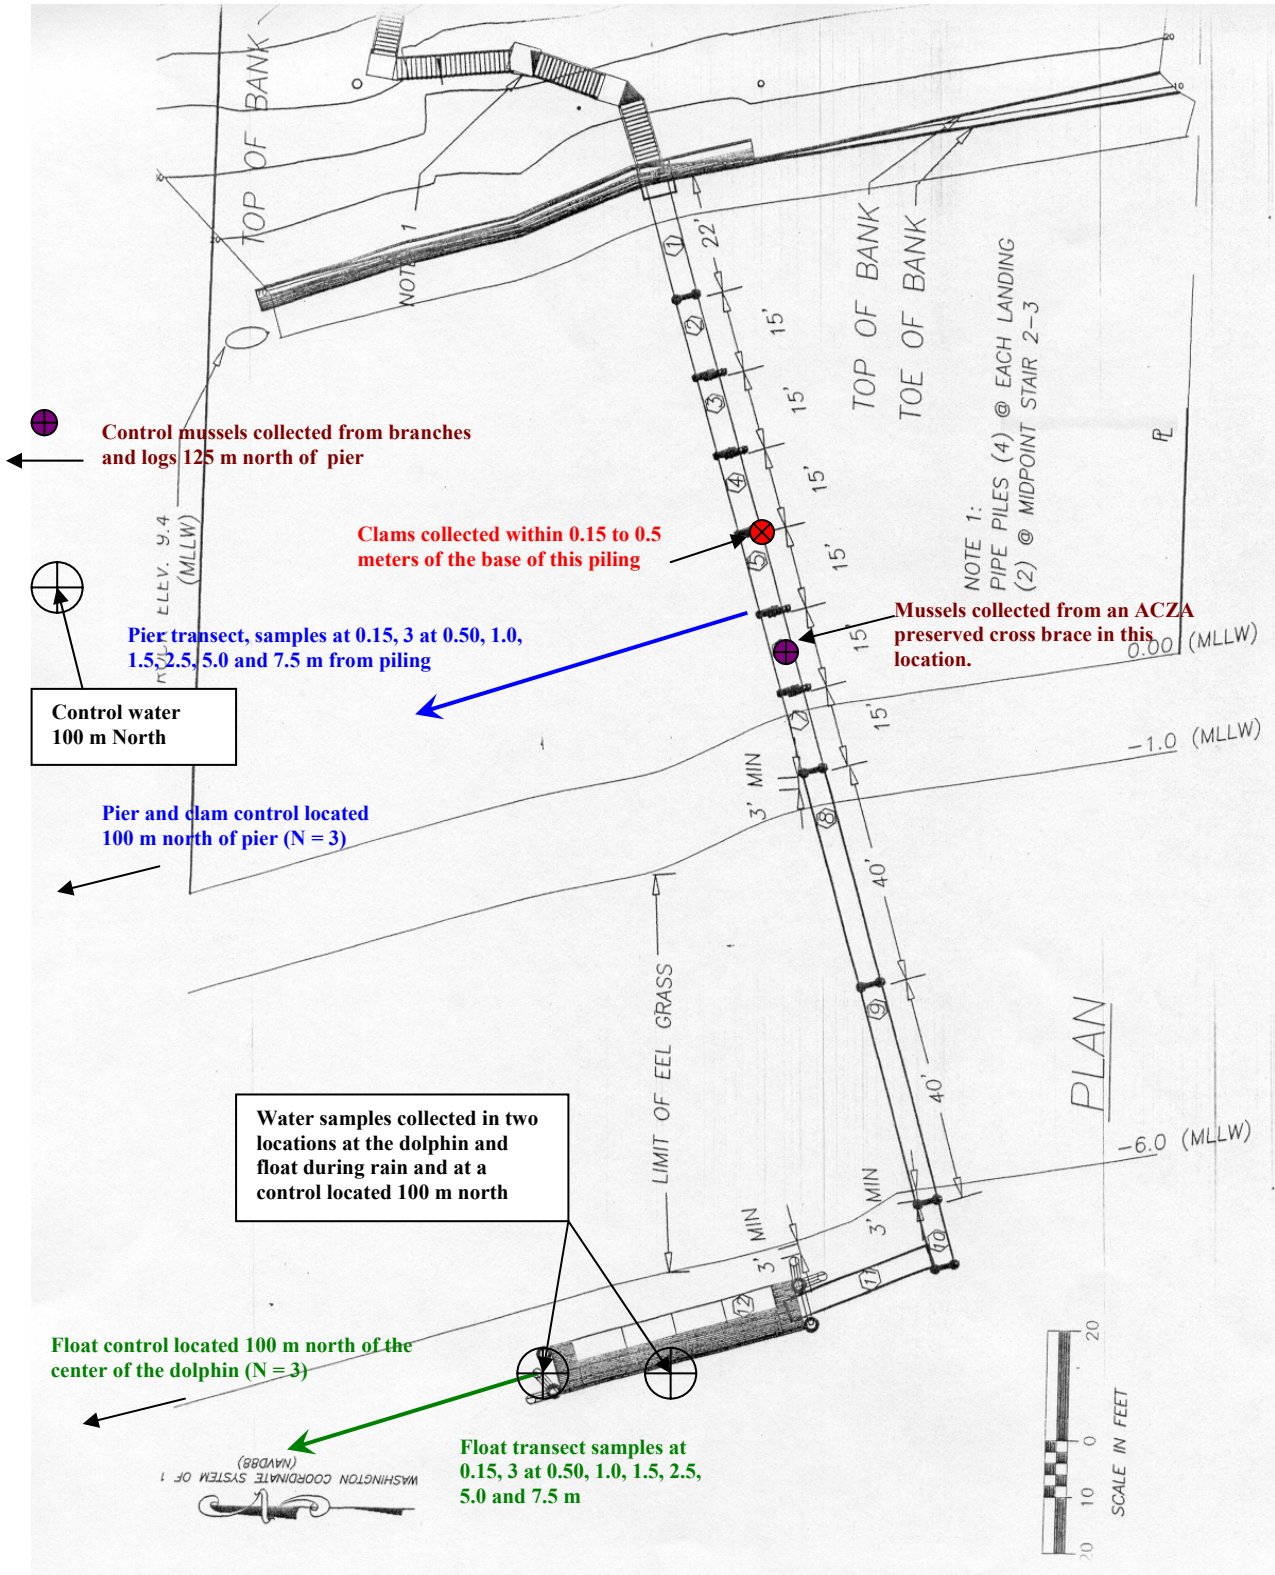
Plan of the pier and float located in Sequim Bay, Washington. The location of all sample stations is provided.
